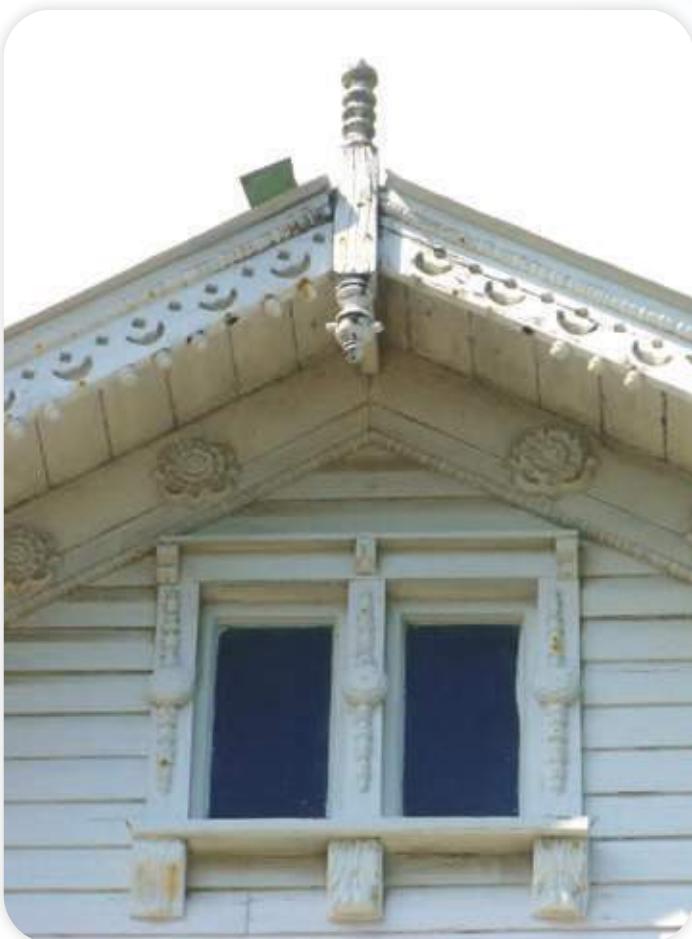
SKYLIGHT, WOOD GABLE POST, ORNAMENTAL TURNED BOSSES AND PIERCED BARGEBOARD DETAIL ON A HISTORIC GEORGETOWN HOUSE
